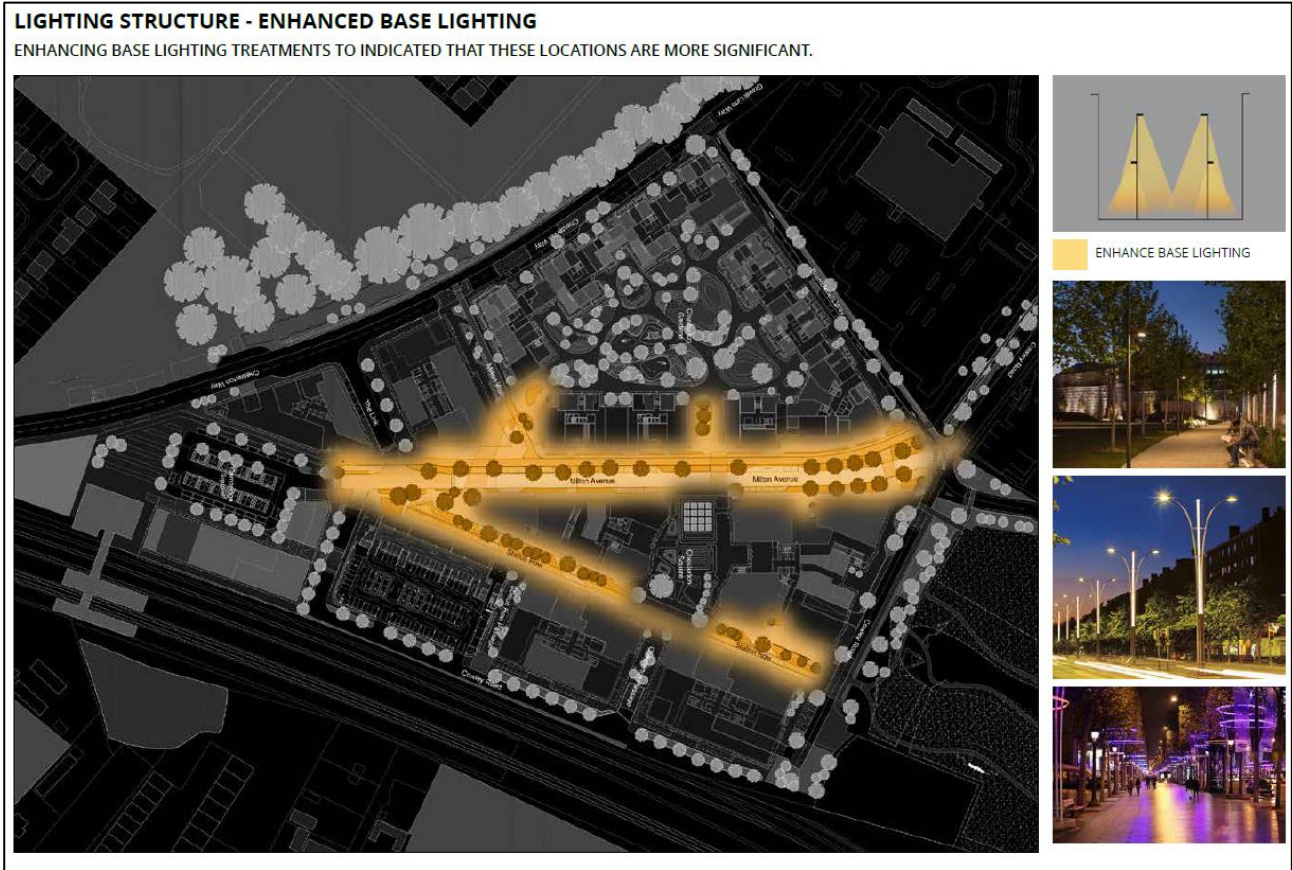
Enhanced lighting systems, these will not have any impact on the buildings and areas outside of the proposed development site.
